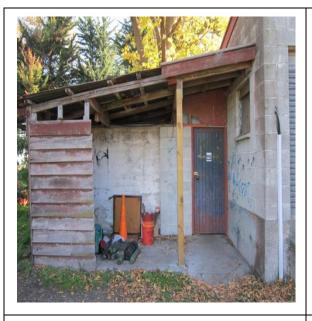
Lean-to on the south of the building with a timber-framed roof and corrugated metal roof.
